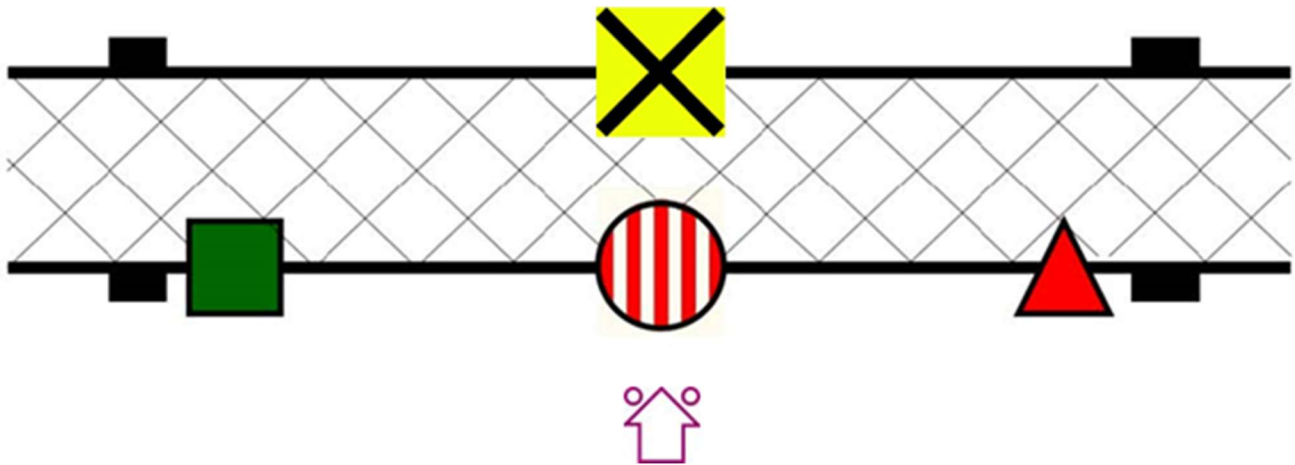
One way traffic – Example of plan view showing "No Entry" as found in China
